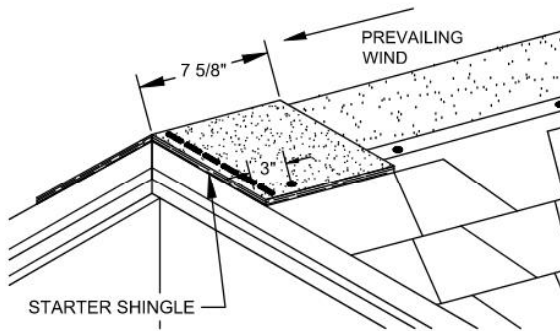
Placement and Fastening of the RidgeFlex™ Starter Shingle
